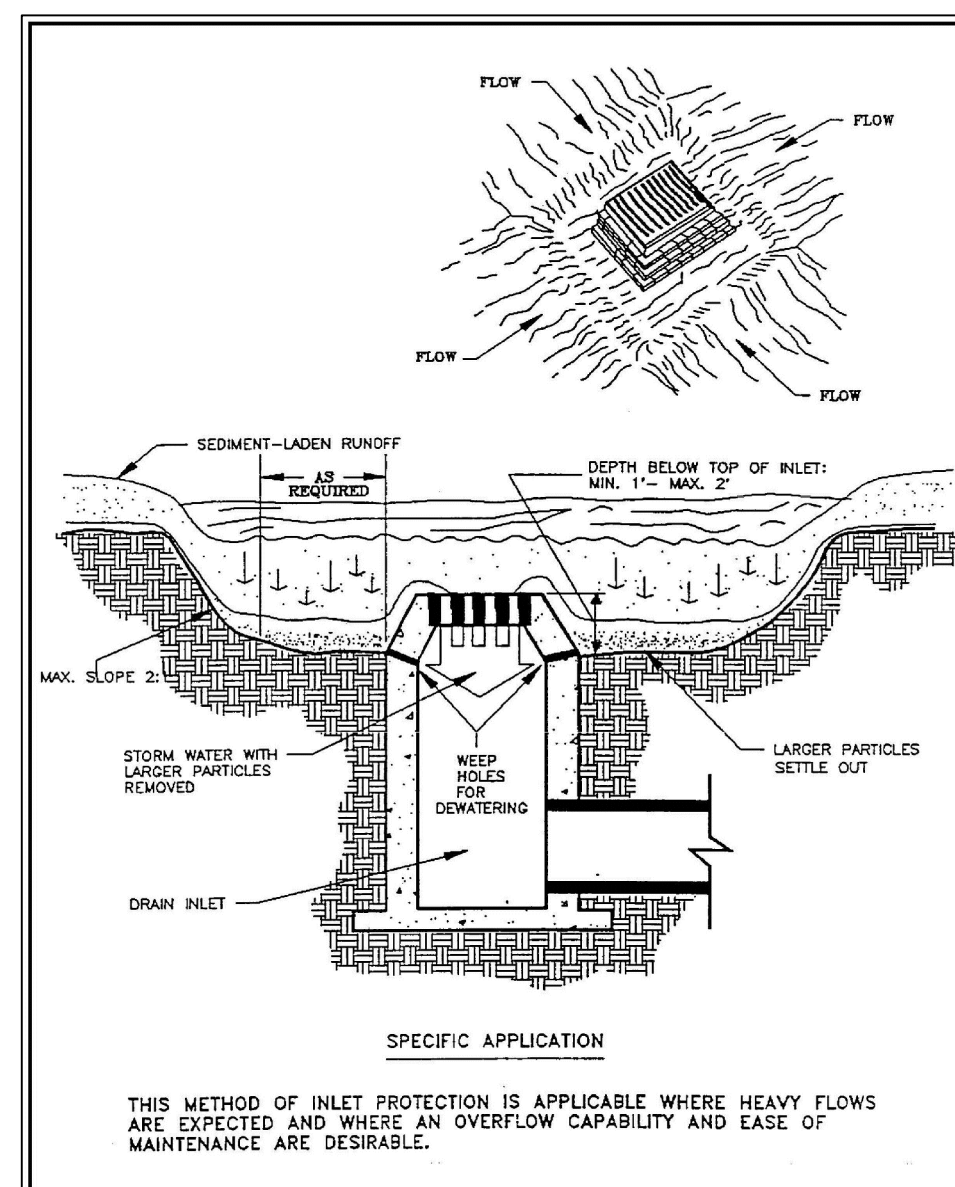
Excavated Drop Inlet Sediment Trap
